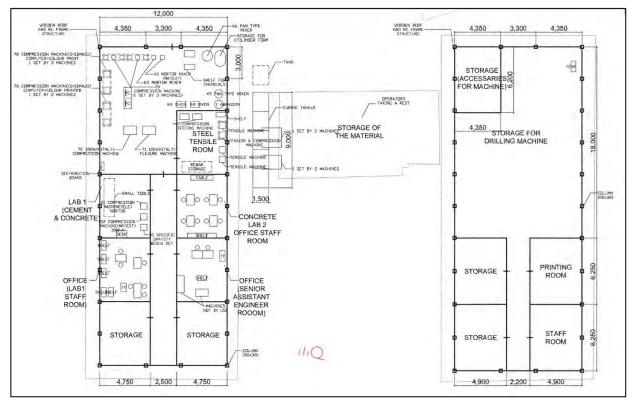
Situation of YQCS Concrete and Steel Research and Testing Laboratory Facilities
